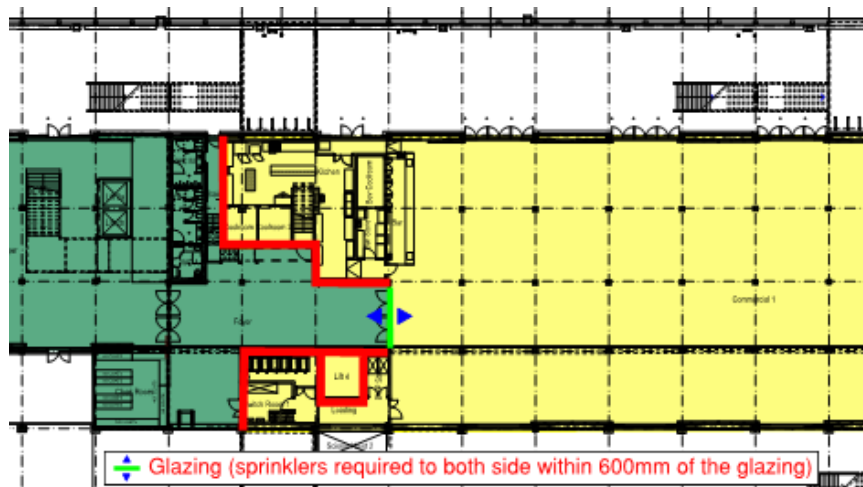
Pier 2/3 Ground and mezzanine - Wall and doors separating Foyer from Commercial 1 – Indicative illustration of sprinklered glazing (to be located on both sides of glazing)
